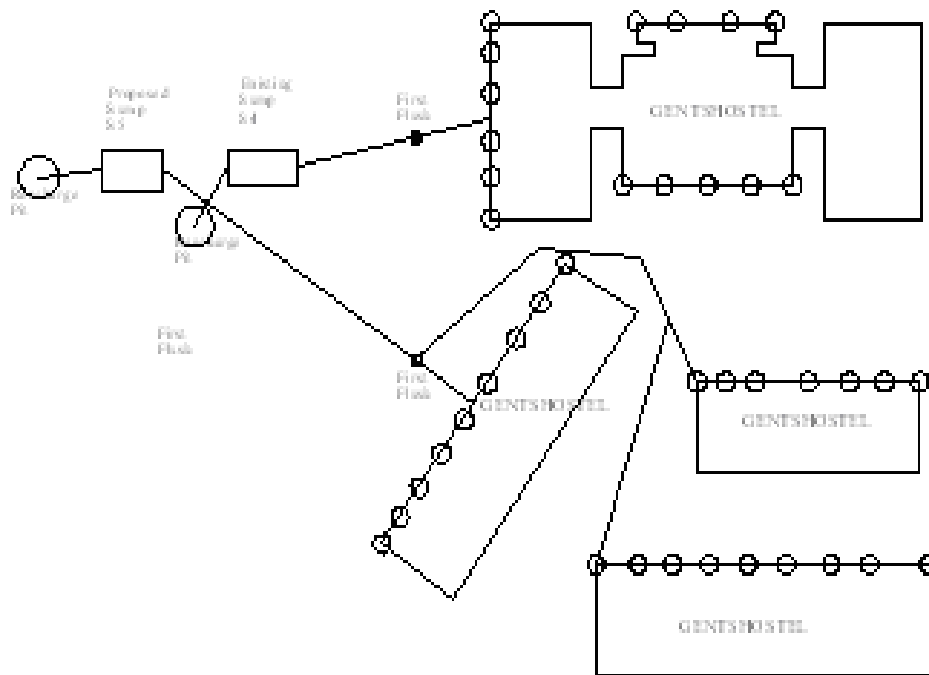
Schematic Plumbing Layout of Collection System for Sumps S4 & S5
